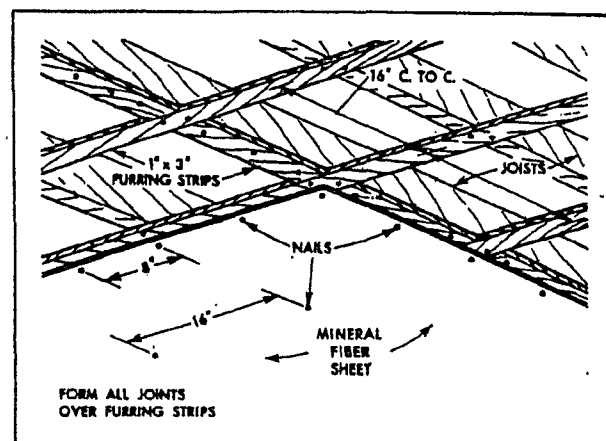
CEILINGS - Install 1 in. x 3 in. furring strips on 16 in. centers over joists, at right angles. Secure with two nails at each member. Form joints over furring strips.
